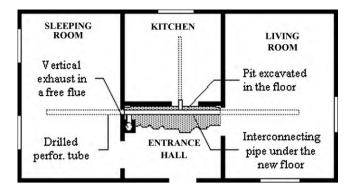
Group K–Perforated tubes drilled into the sub-floor region from the floor pit. This solution requires a new floor in the room where the pit was excavated.
